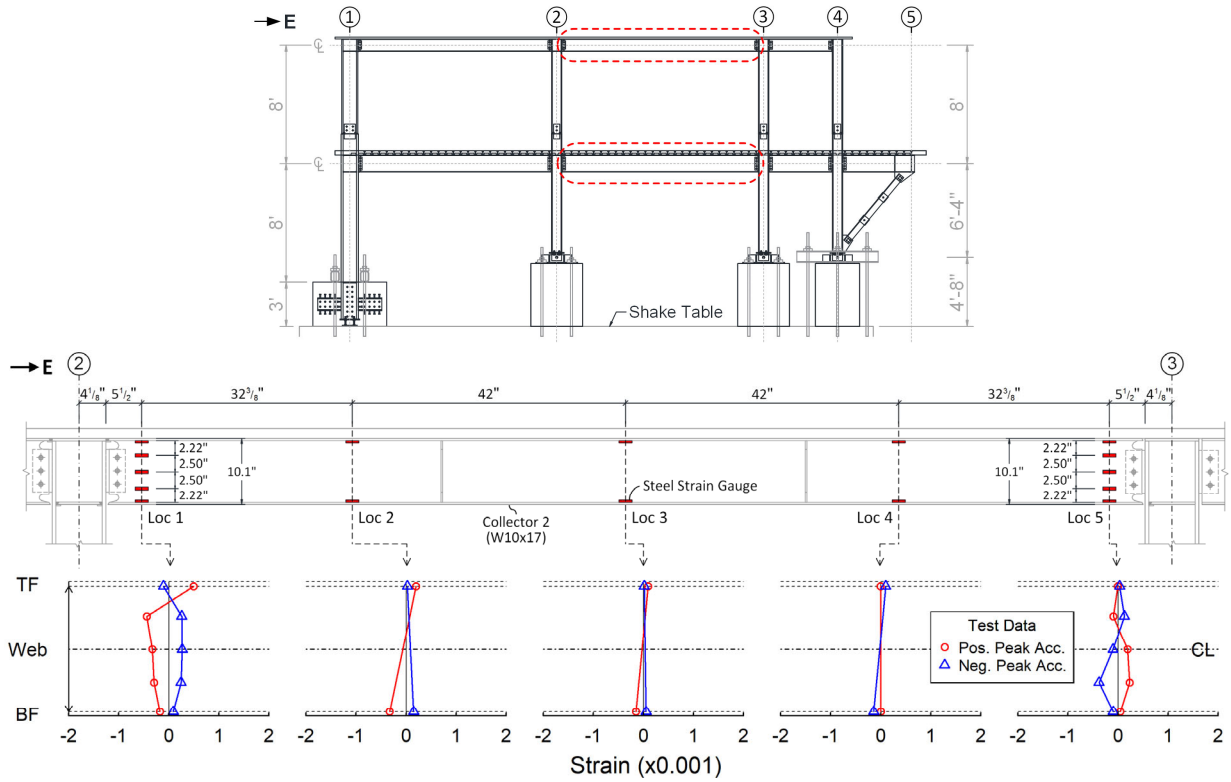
Test 2B-5: Strain Profiles of 2<sup>nd</sup> Floor Collector 1 Beams
